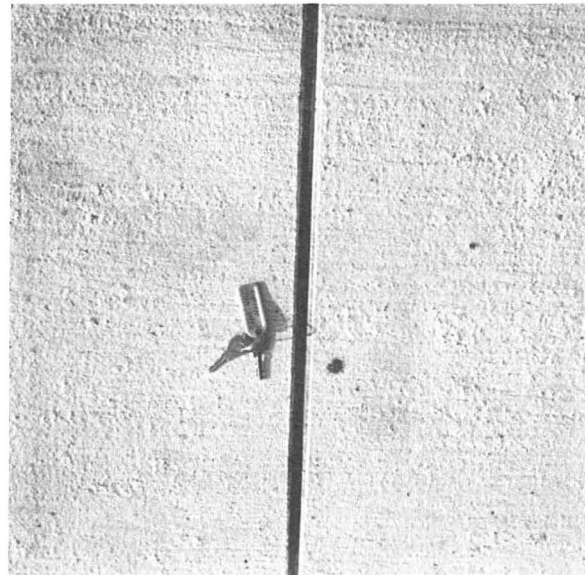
Swiss pavement joint showing bevelled saw cut and compression seal in position.
